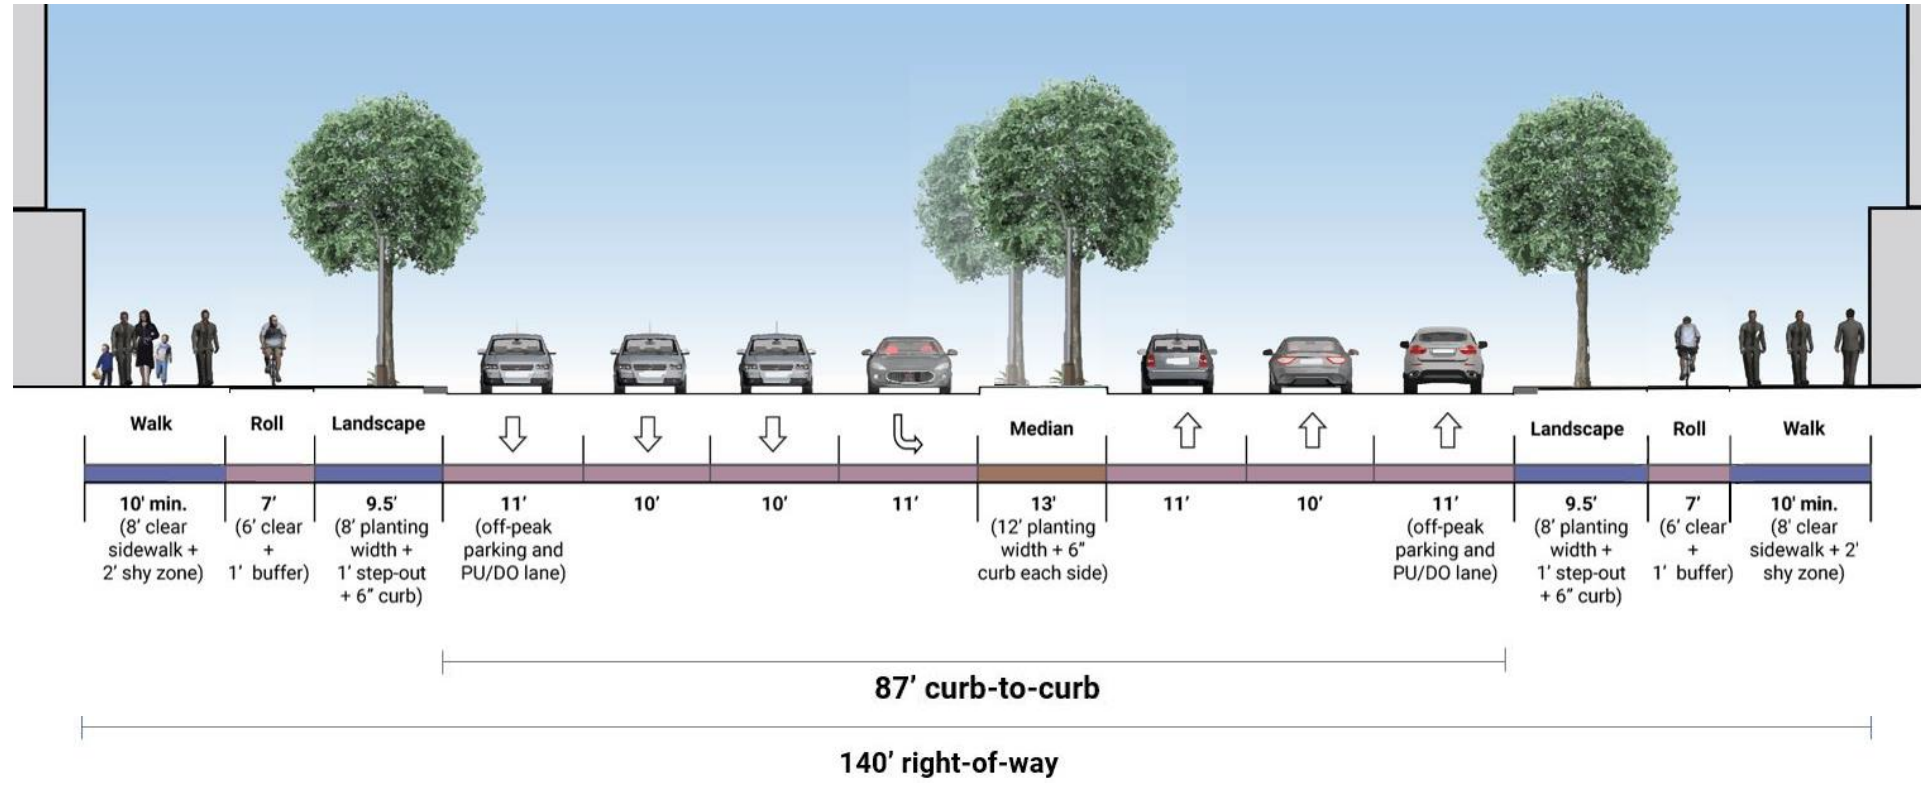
Recommended cross-section from 23<sup>rd</sup> Street to 18<sup>th</sup> Street.
